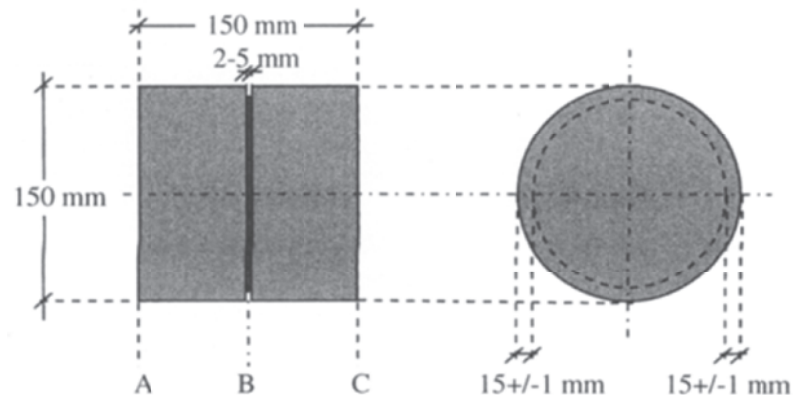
Schematic of the standard test specimen for the uni-axial tensile testing. Planes A, B, and C are parallel (Vandewalle et al., 2001)
